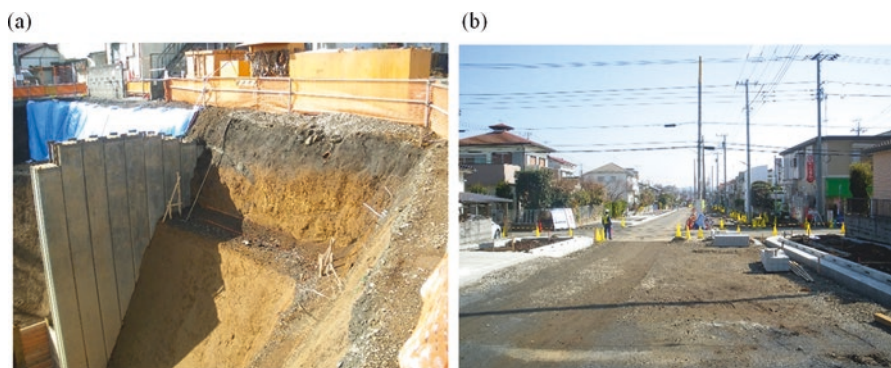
Overview of the road construction site in Sanda-town, Hachioji-city, Tokyo, Japan. (a) a cliff before road construction, which will be leveled to connect the lowest point to the highest point within the construction zone, (b) subbase construction with crushed stones after compaction using a heavy roller
